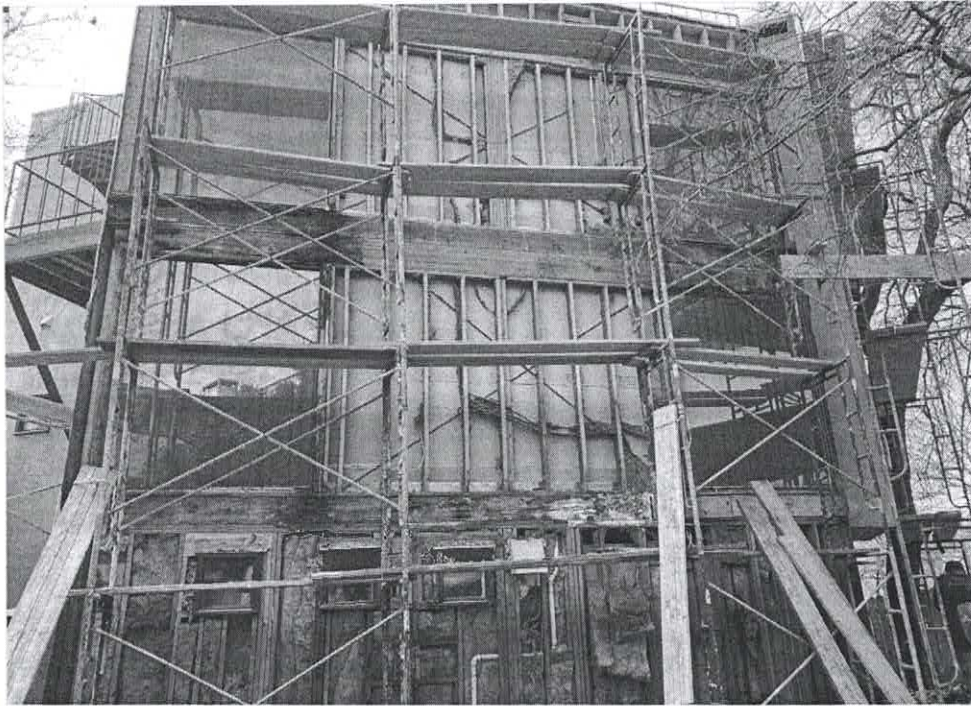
Exposed east wall showing moisture damage by the new window installations. (Parker Engineering Photo, Jan 28, 2021 post OSB removal)
